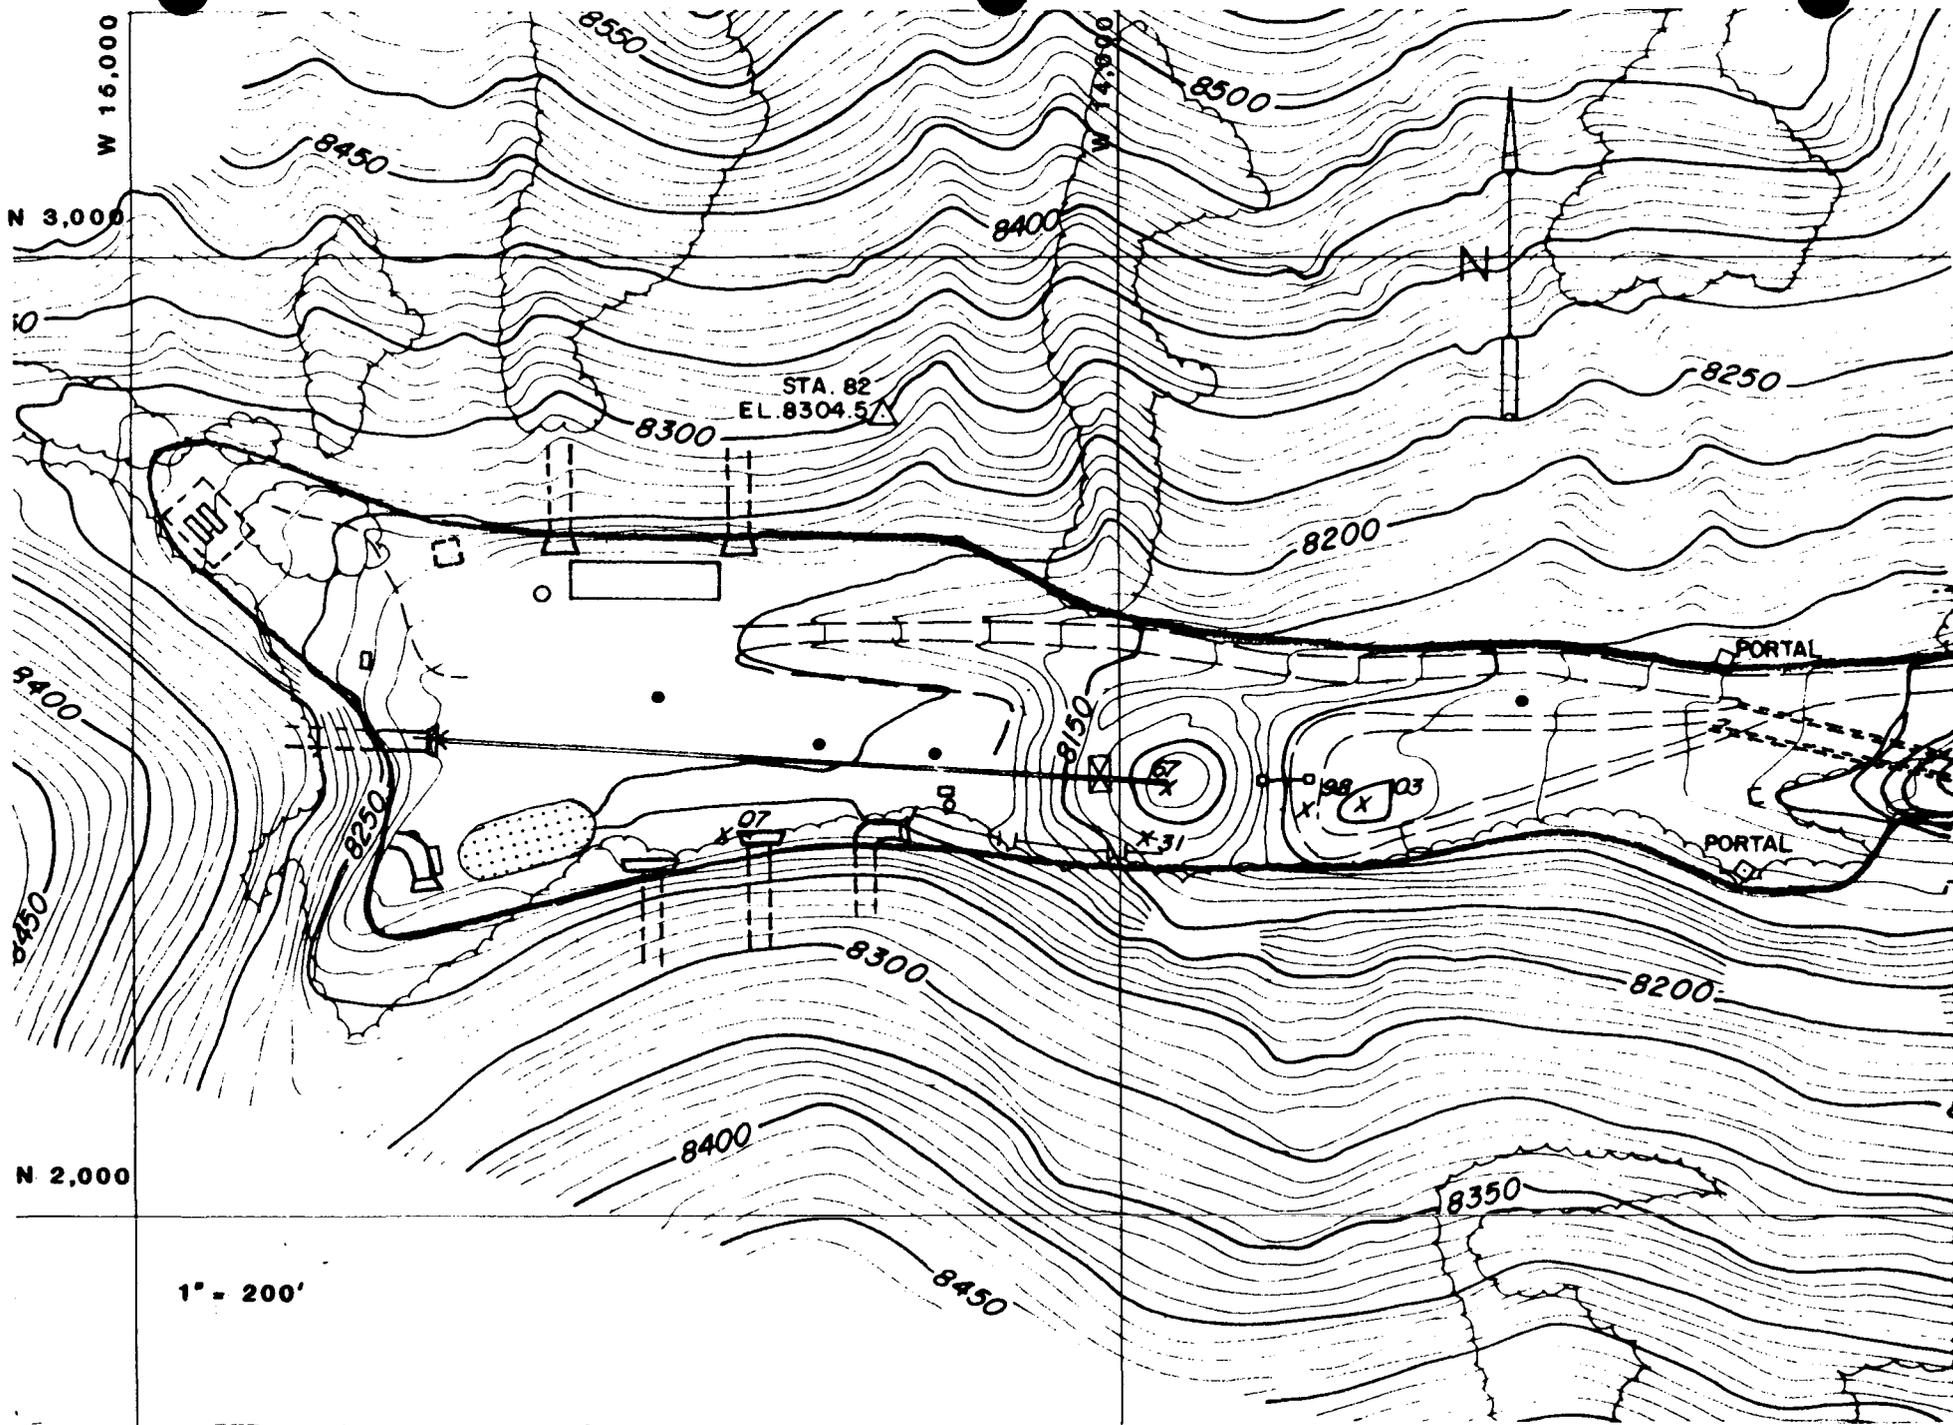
MIDDLE FORK TEMPORARY UNDERGROUND DEVELOPMENT WASTE STORAGE SITES
